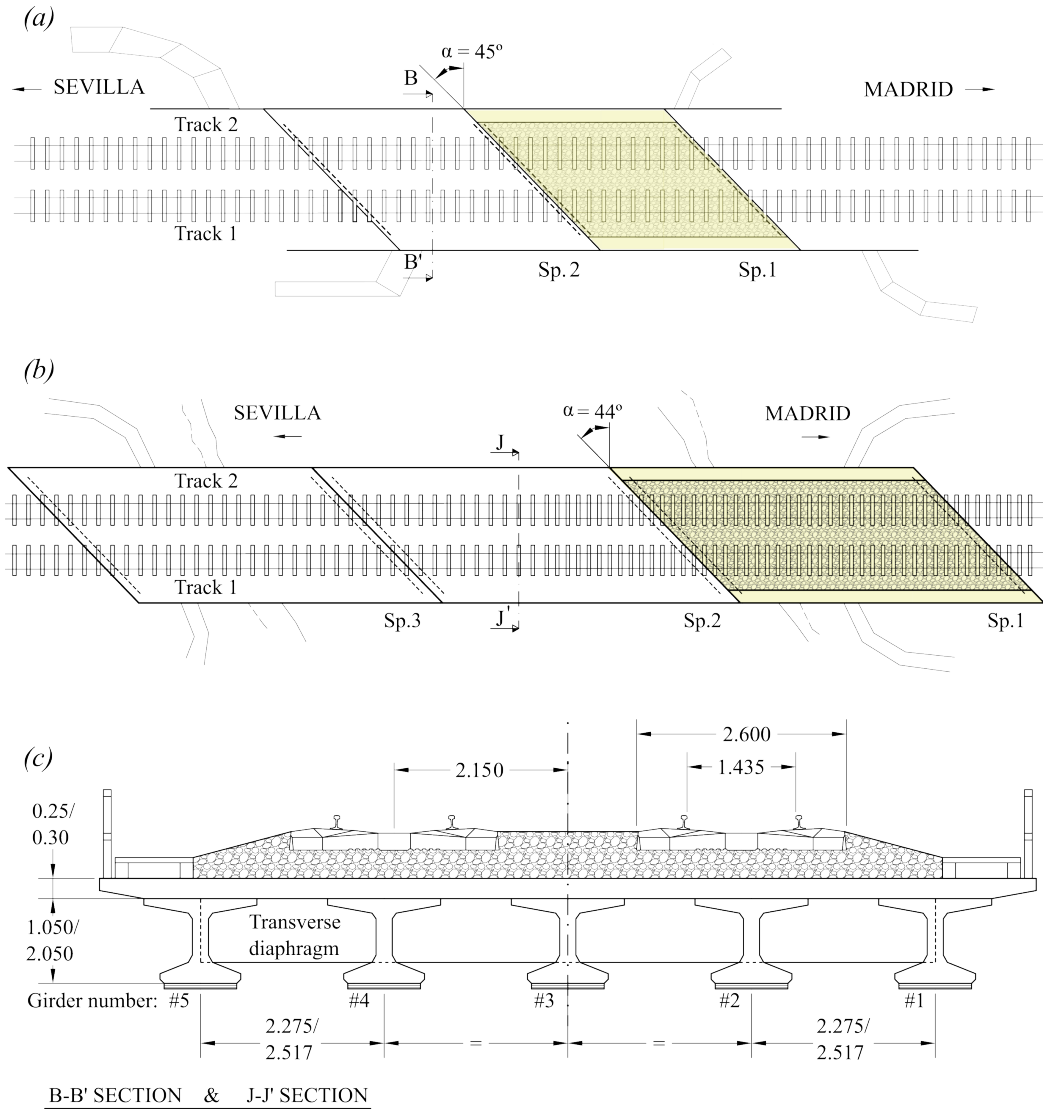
Technical drawings of (a) Arroyo Bracea I Bridge top view; (b) Jabalón Bridge top view; (c) Arroyo Bracea I and Jabalón bridges cross-section B-B' & J-J'.
